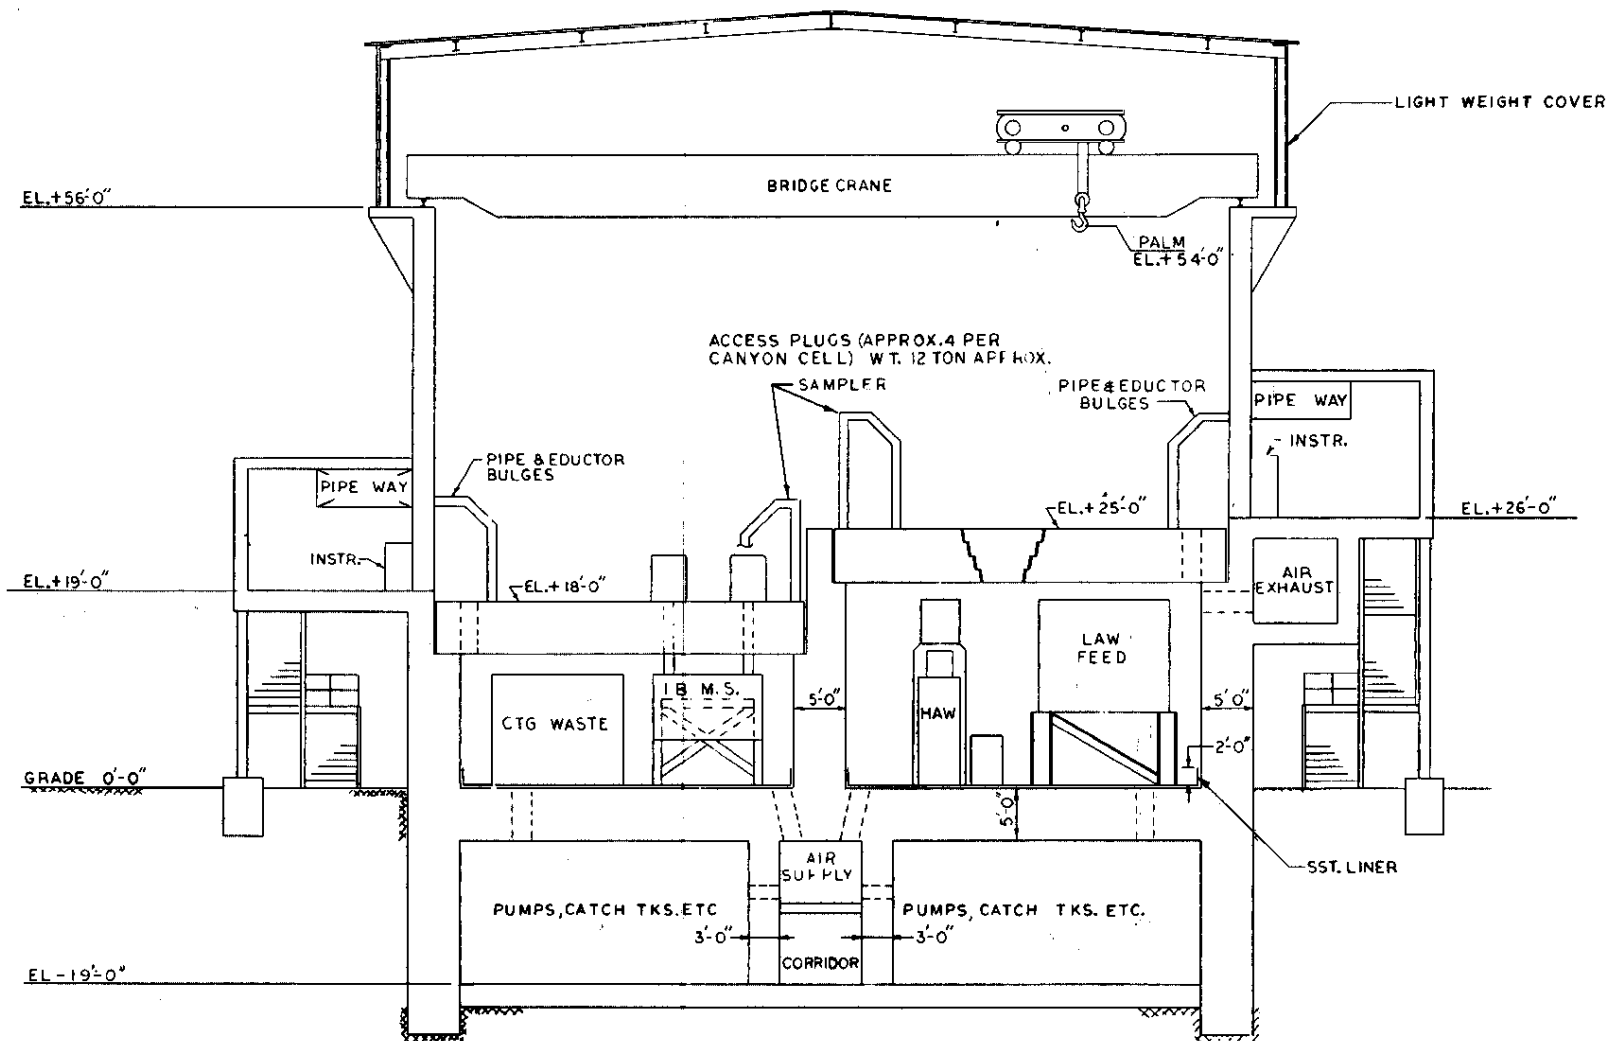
CASE VII - BUILDING NO. 13 SECTION - SHEET 1
